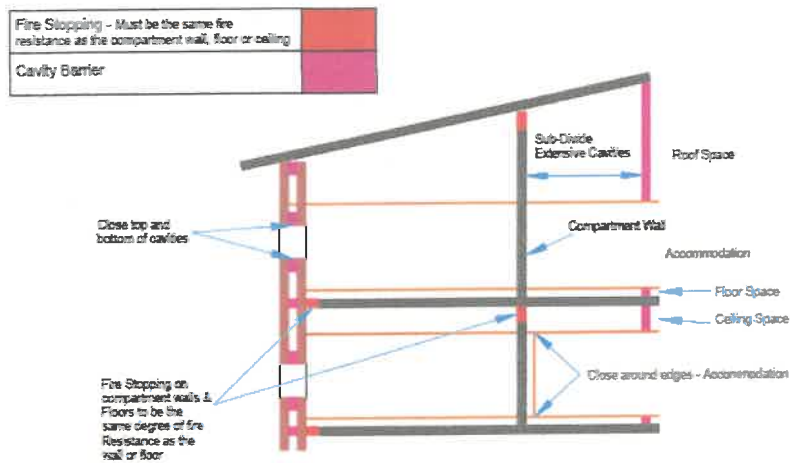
Typical examples of where cavity barriers and fire stopping are required
